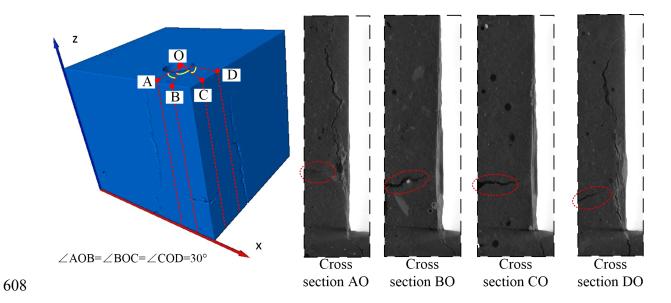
Longitudinal cuts in the 3D reconstructed structure around the steel bar
